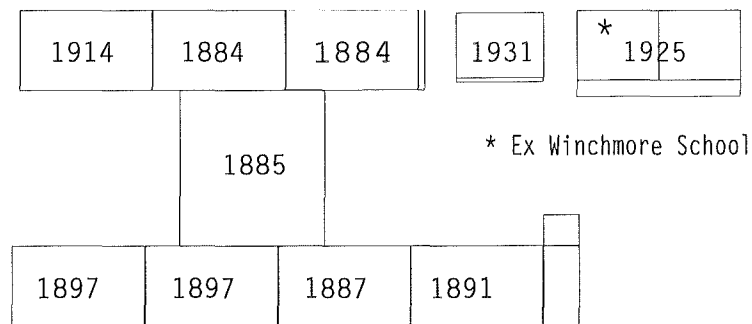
Plan of Hampstead school showing additions made 1884-1925
